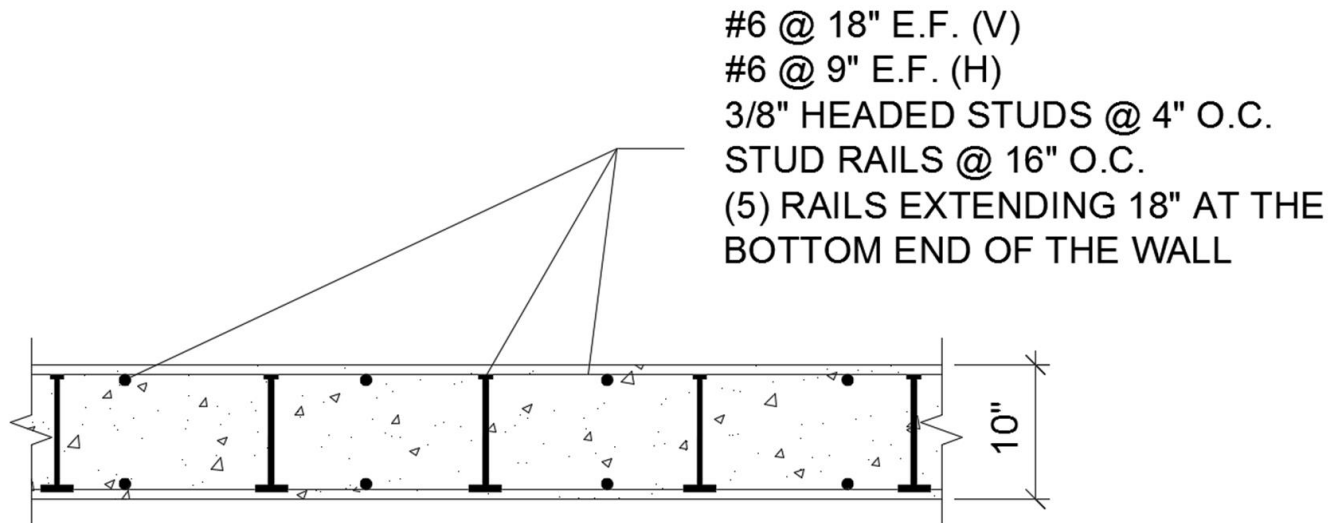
New exterior wall, cross-section at the 4th floor level based on tsunami design requirements.
